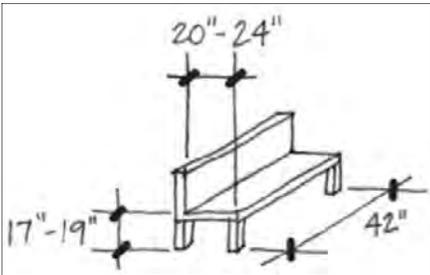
Minimum Seating Dimensions (from MAG Pedestrian Policies and Design Guidelines)
